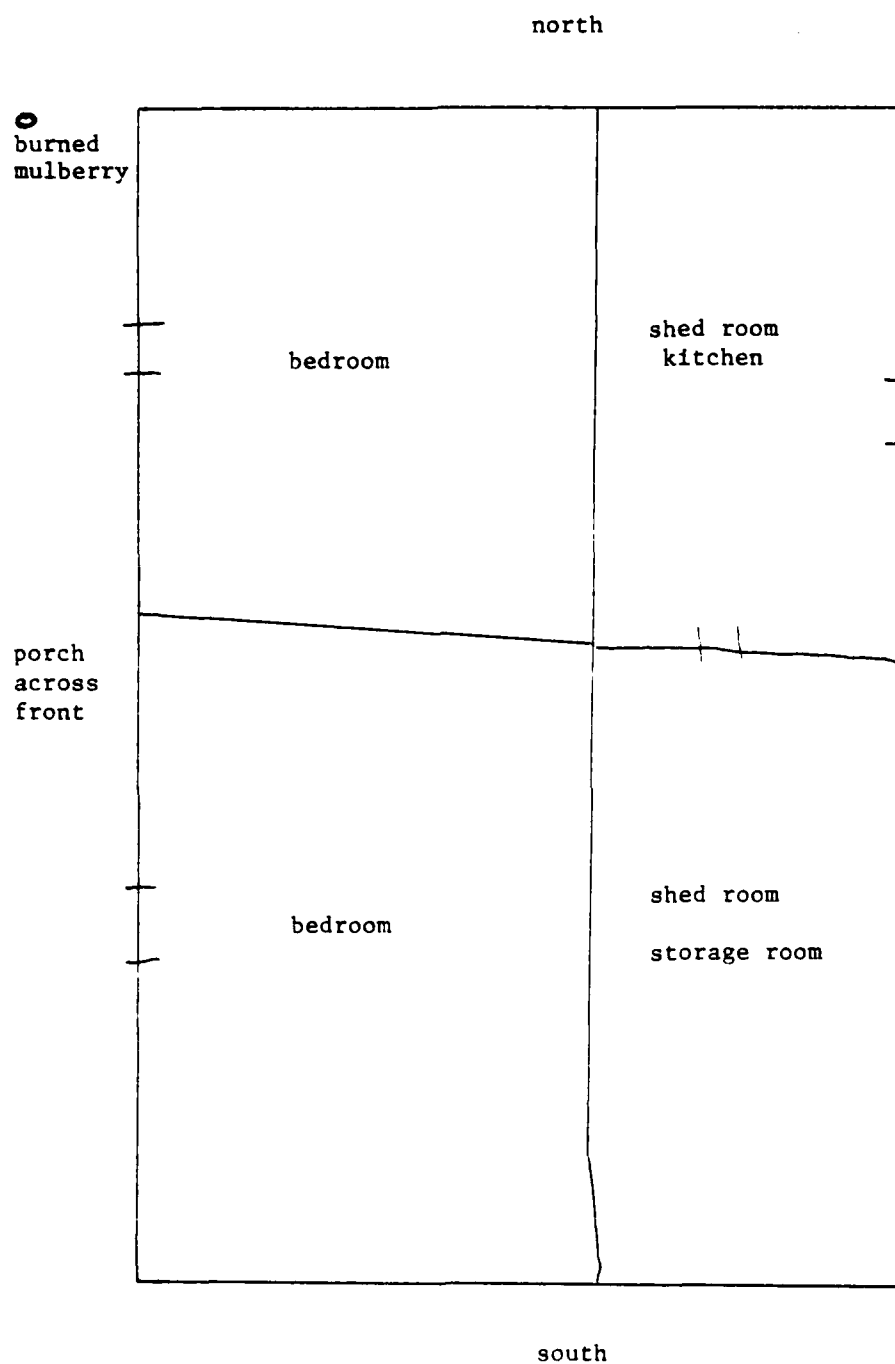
Floor plan of Harris ferry house. Drawing by Josie Kennedy.
